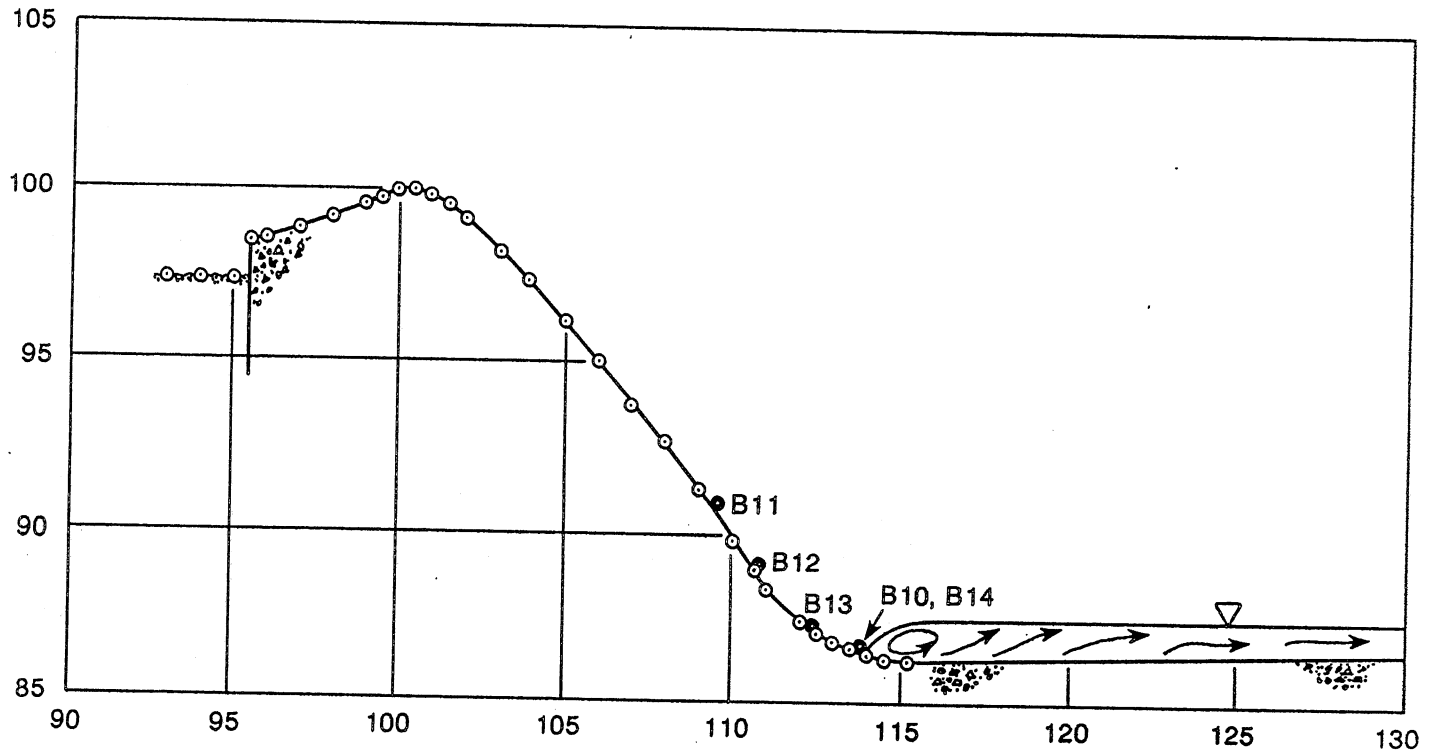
Section view of March 12, 1985, spillway sampling locations.
